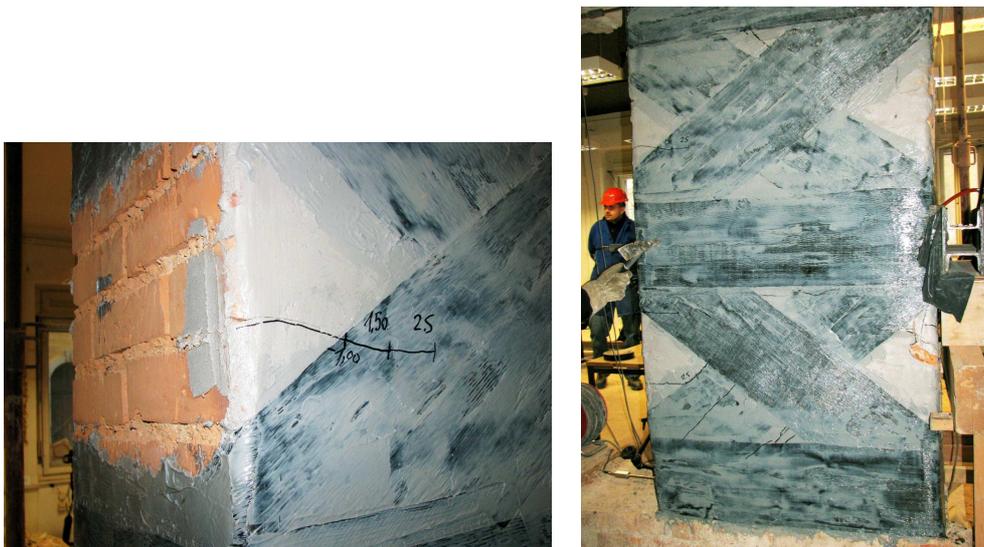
Specimen H1w: the development of first cracks (left) and the final stage of the test (right)
